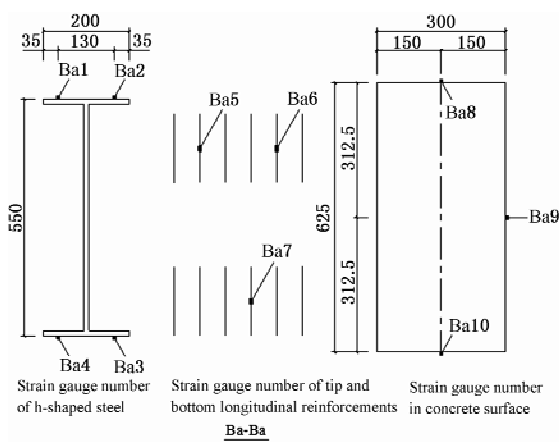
Layout scheme of strain gauges in beam section of the specimen
